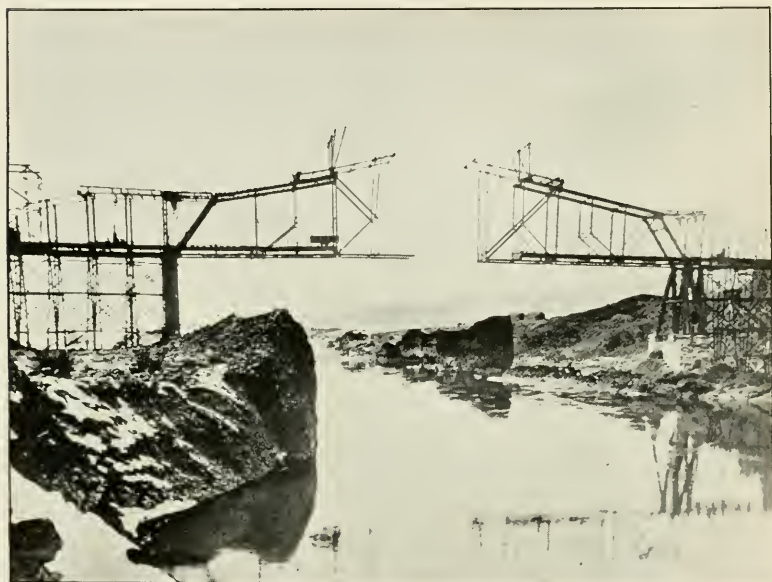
COLUMBIA RIVER BRIDGE. EDGE MOOR BRIDGE WORKS.
